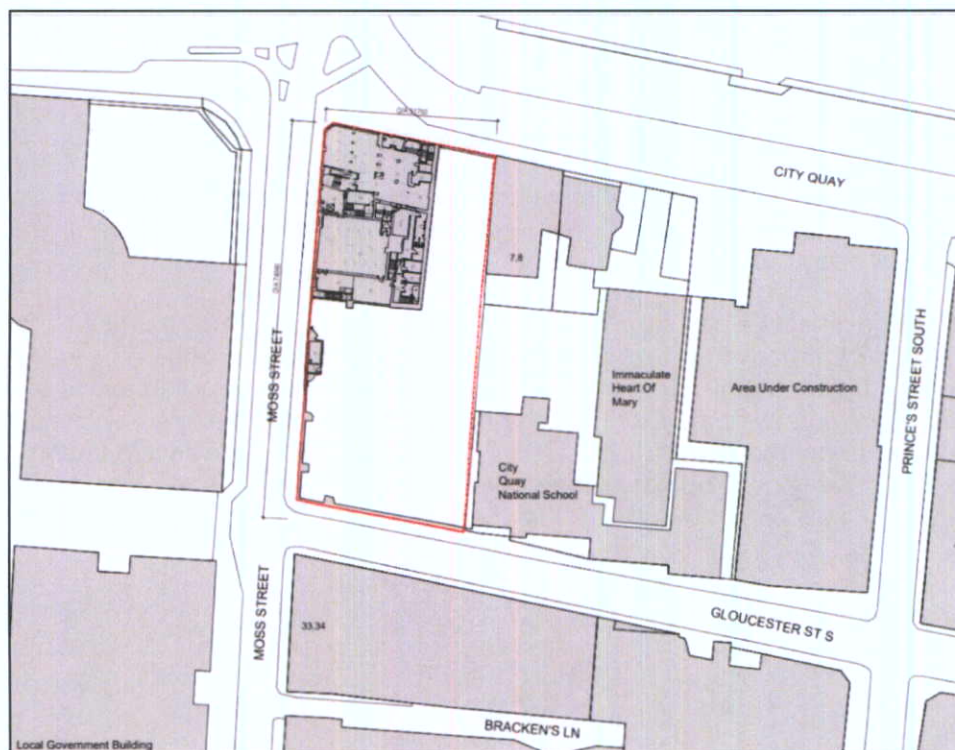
Existing Site Plan (Mahoney Architecture 2022)
